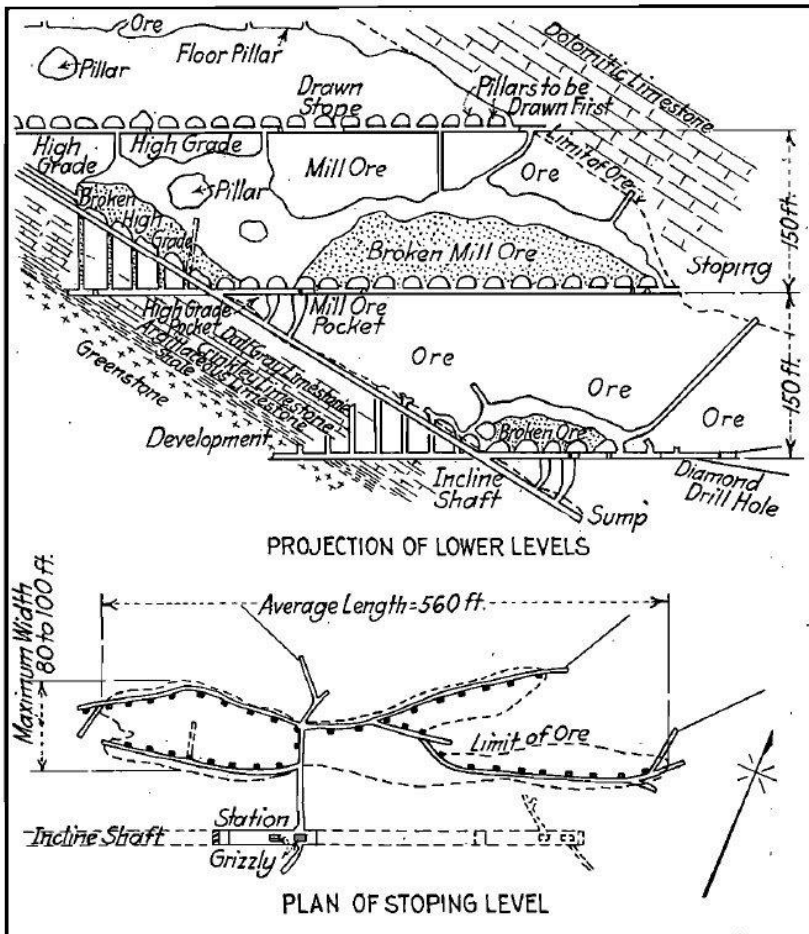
Cross-section and plan views of the mining of the fissure veins with the shrinkage stoping method. Source: Birch (1924).
